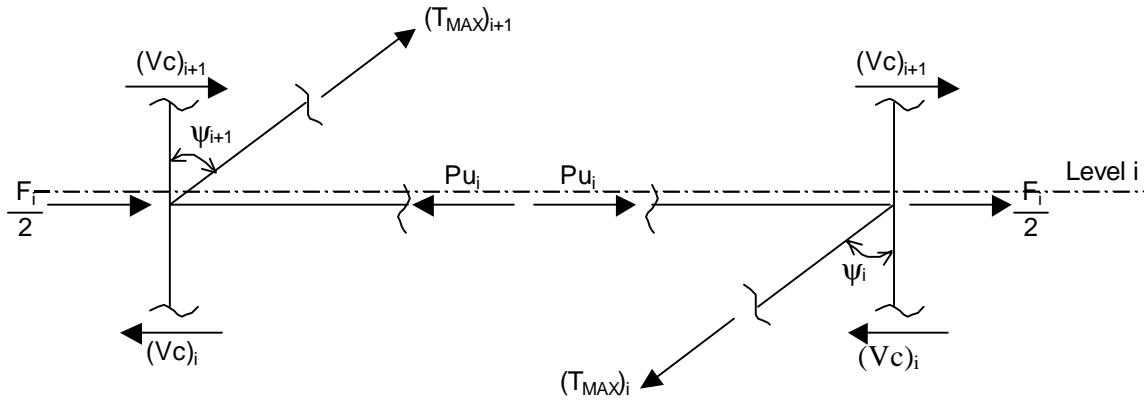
Required Axial Strengths of Sixth-Floor Beam per FEMA 450 Section 8.6.3.6.2
